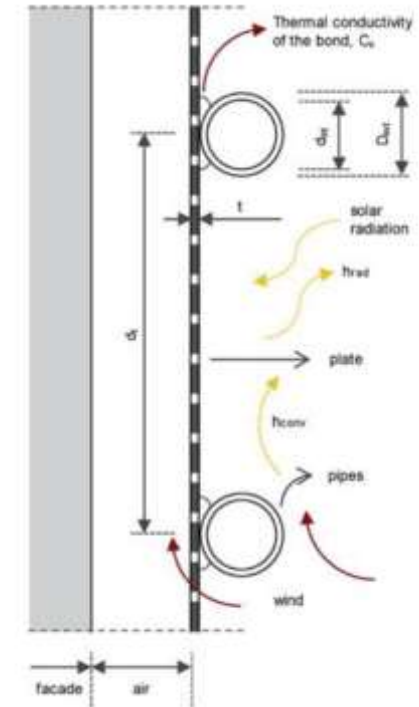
Schematic section of the cooling panel and heat transfer factors.
